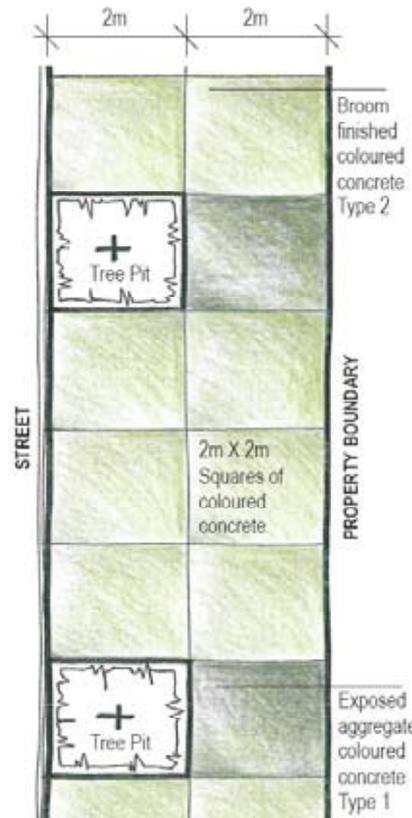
(e) – Footpath Paving – Town Centre Access Street
